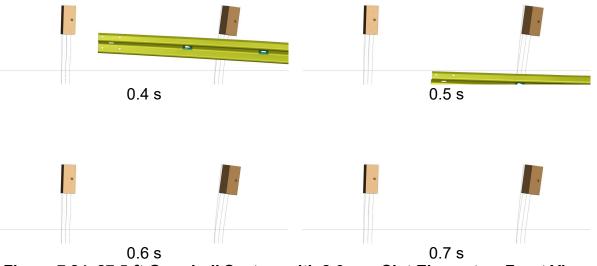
87.5-ft Guardrail System with 2.6 mm Slot Elements – Front View of Downstream Posts During *MASH* Test 3-11
